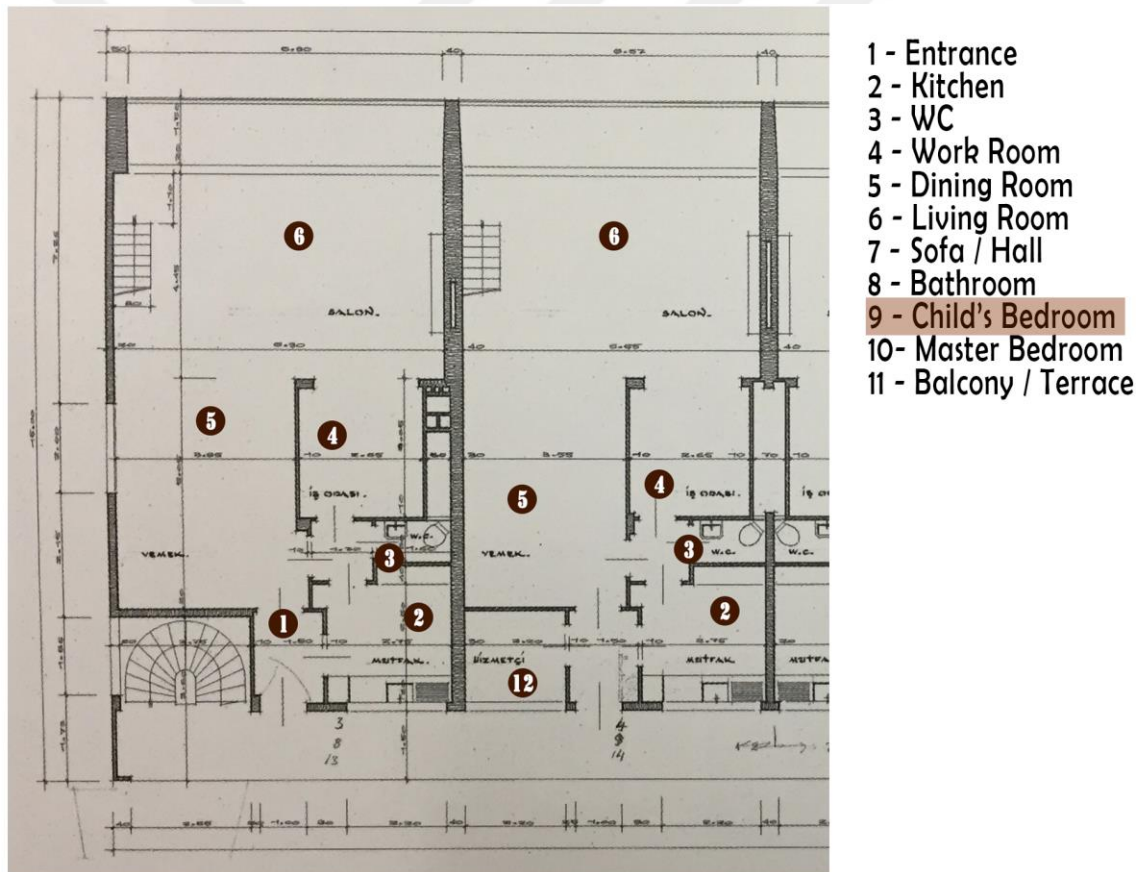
The lower floor plan of Cinnah 19 Apartment, Ankara (Source: Bancı, 2021)
